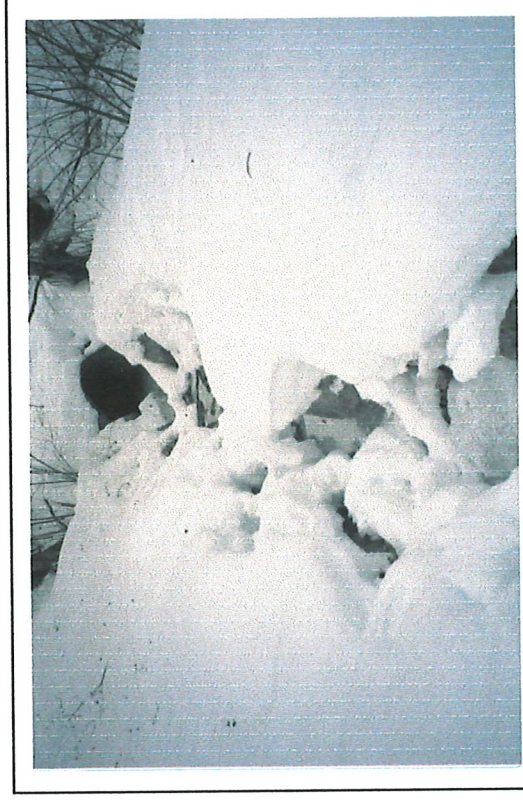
March 2002. Looking upstream along the outlet channel to the culvert installed in 1999 from photo point 2.
